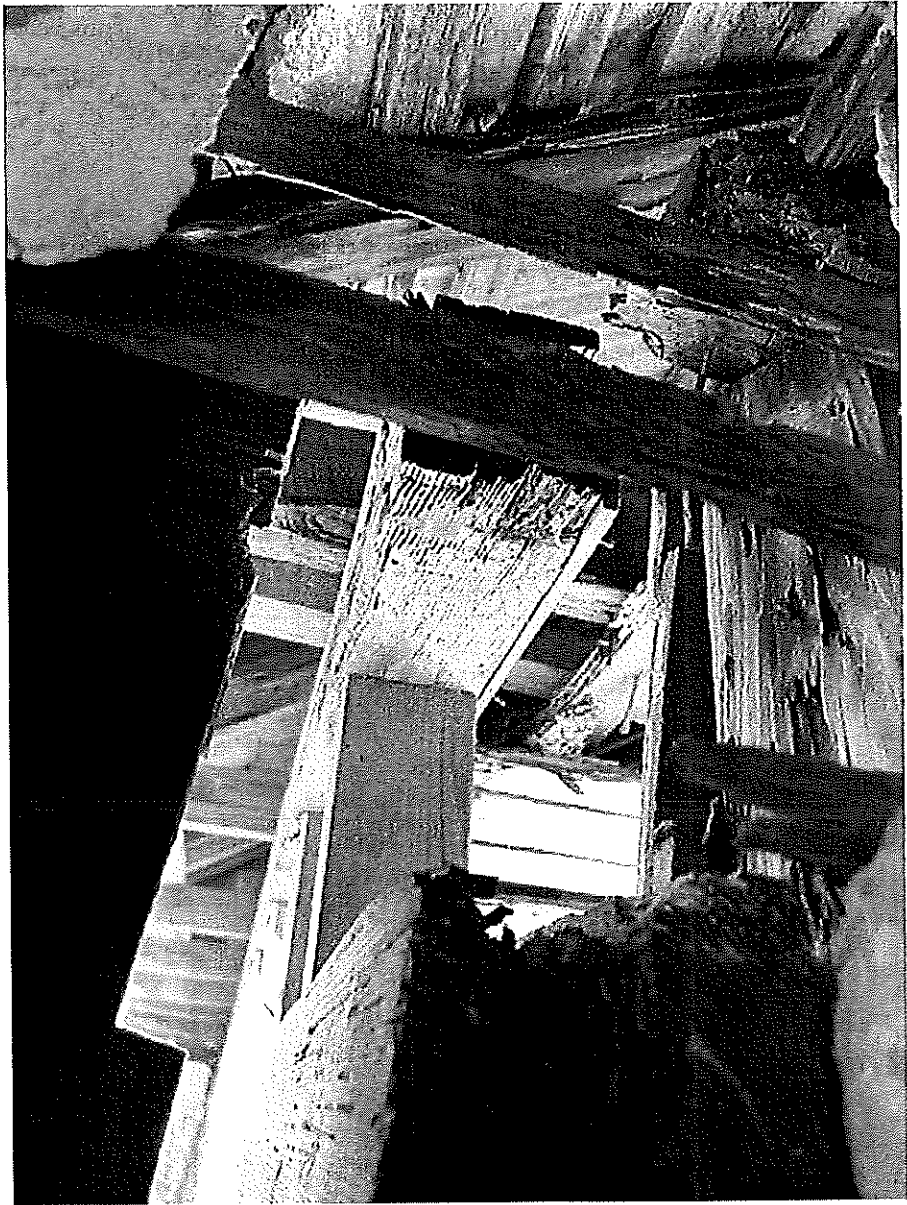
roof deterioration from weathering and termites of rafters, cross bracing and purlins
